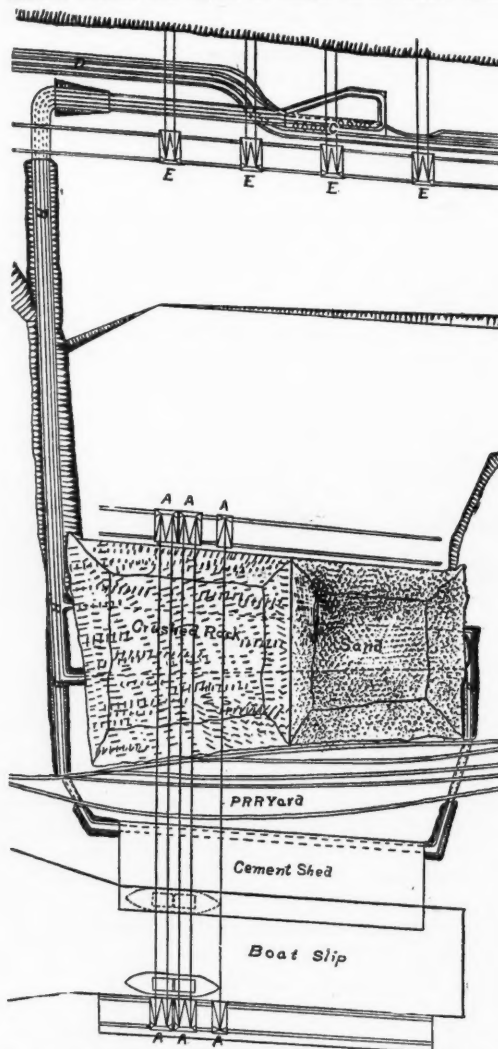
Gatun Locks; A, Cableways for Unloading; B, Automatic Railway from Storage to Mixers; C, Concrete Mixers; D, Electric Railroad; E, Cableway for Delivering Concrete in Locks.
